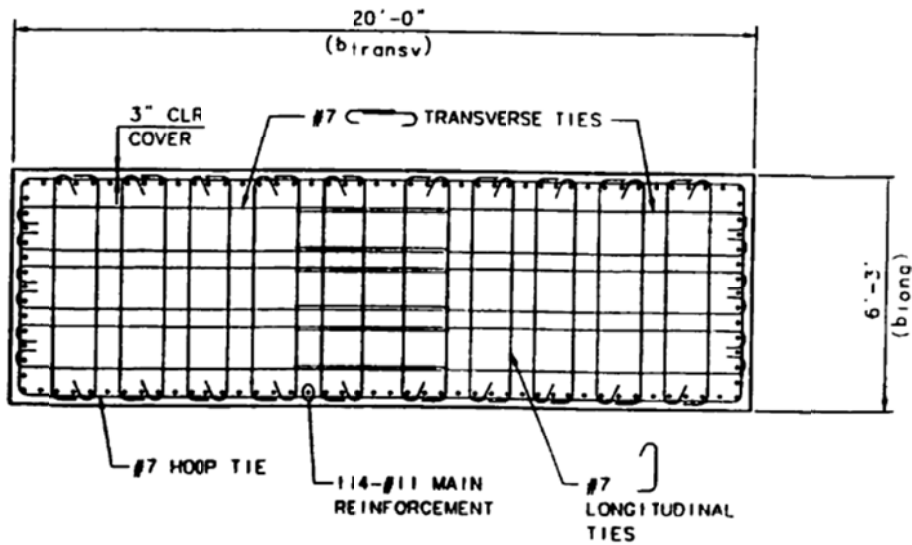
Bridge No. 1 – Cross Section in the Column
